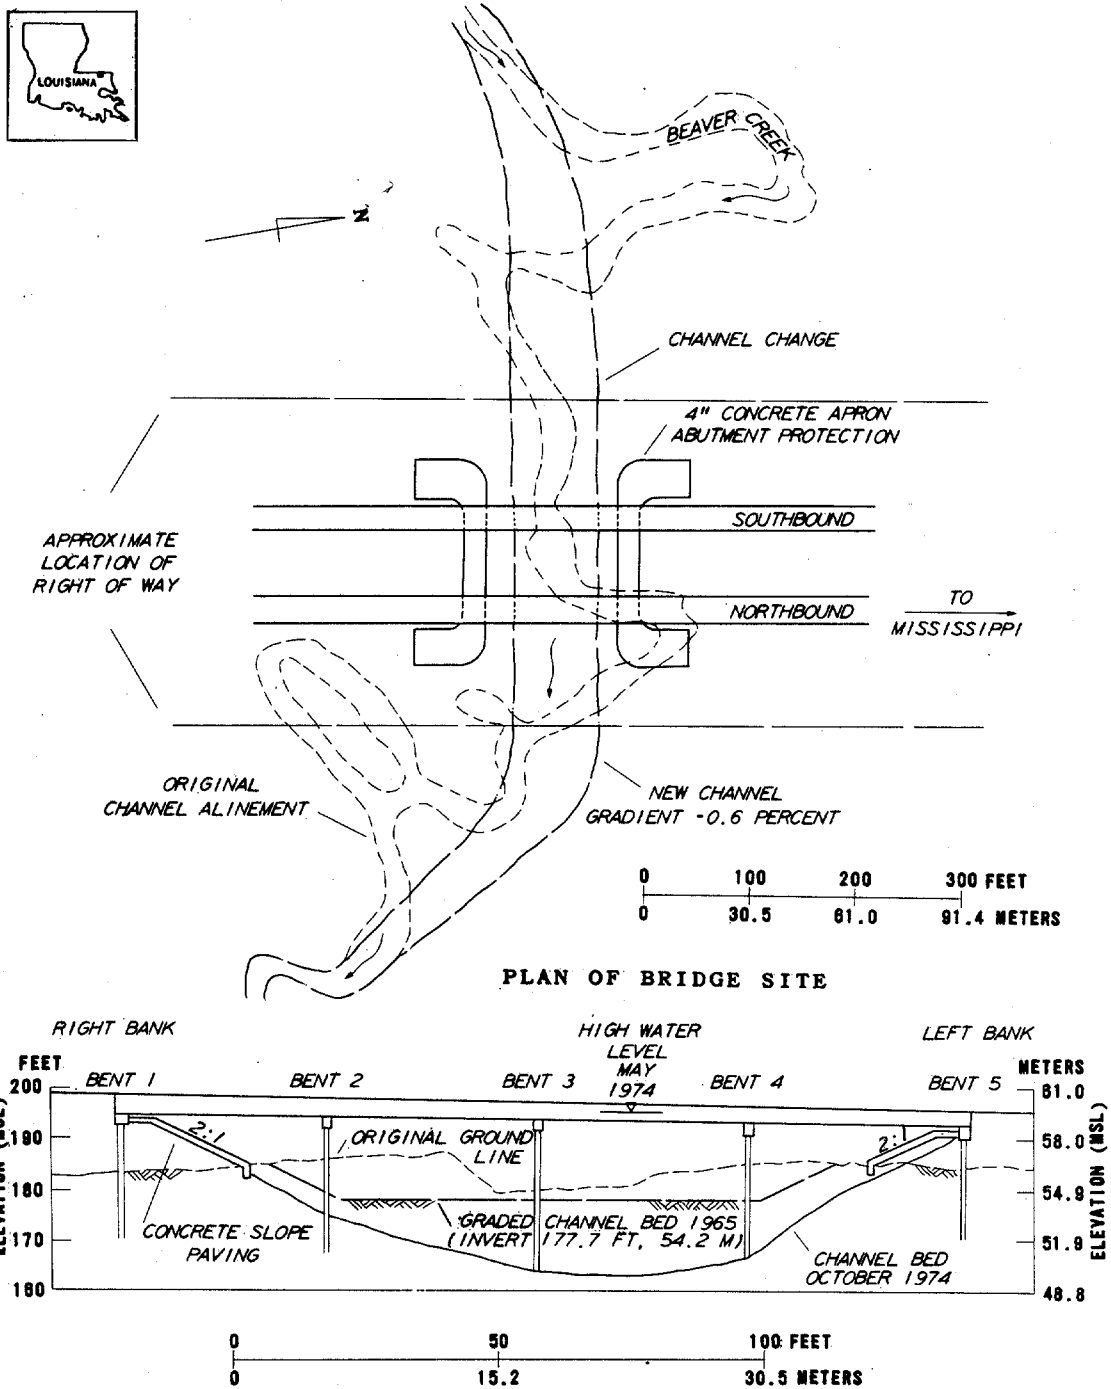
Plan and cross section of Beaver Creek at I-55 bridge.
